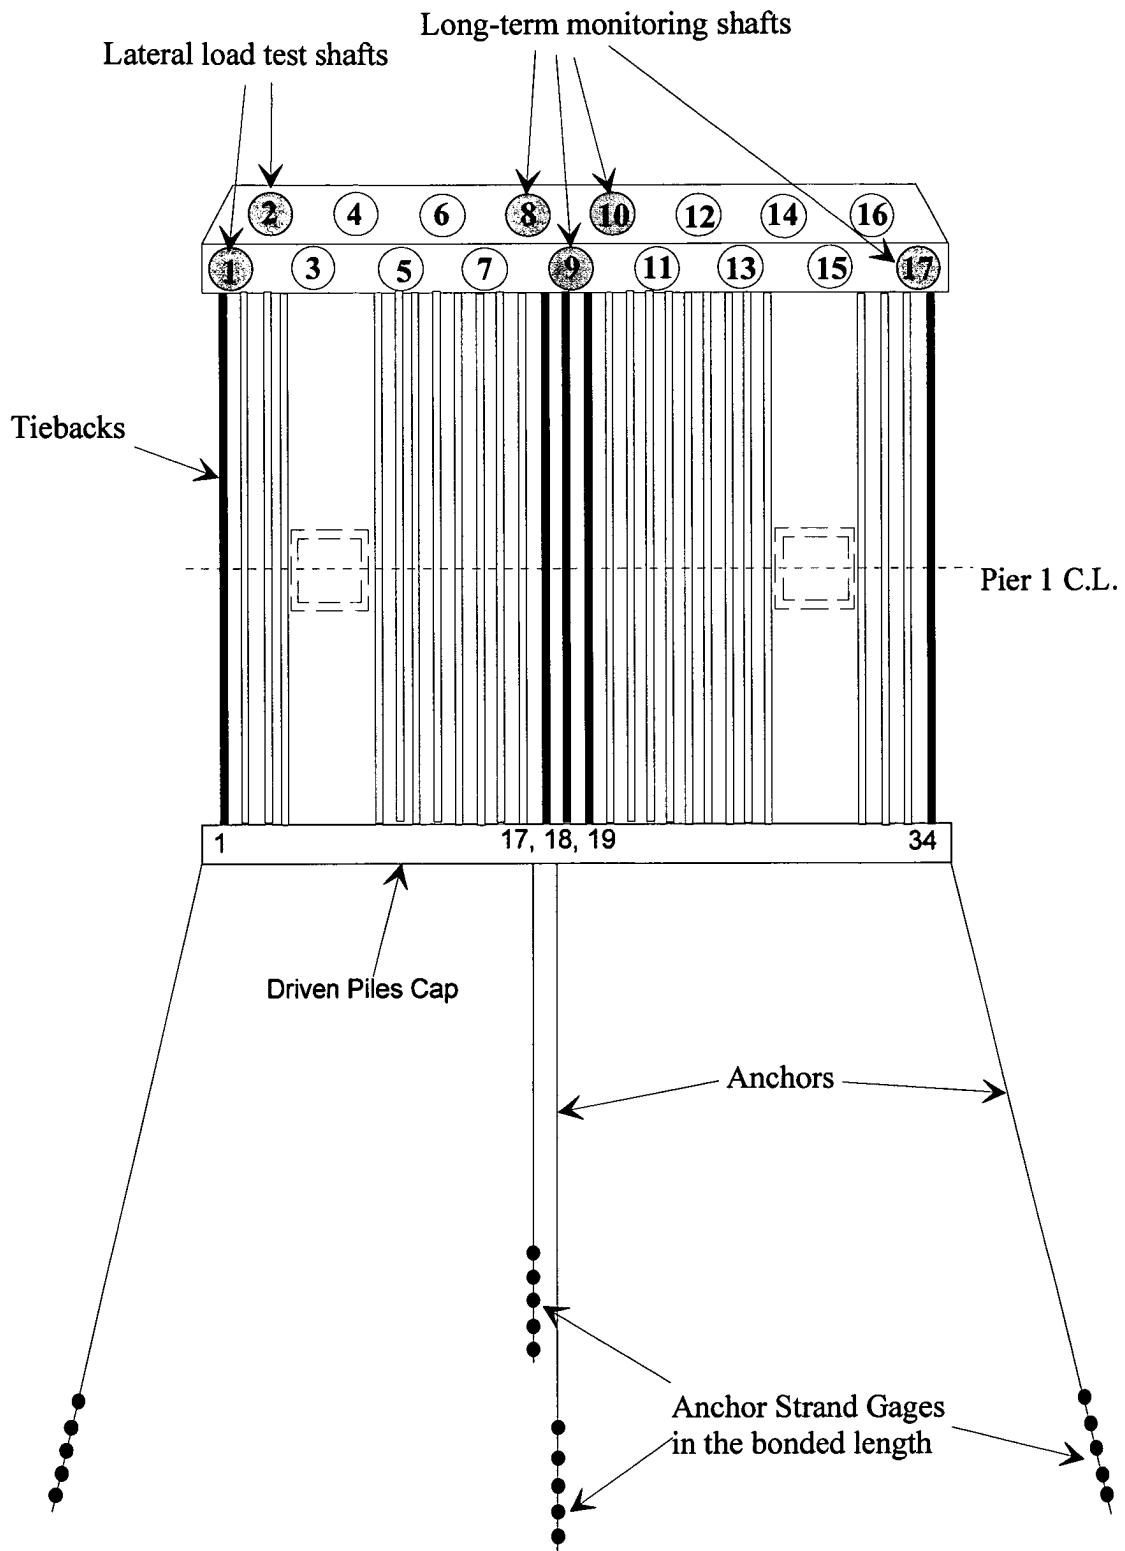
Plan Showing the entire stabilization system and the locations of instrumented elements of the system.
